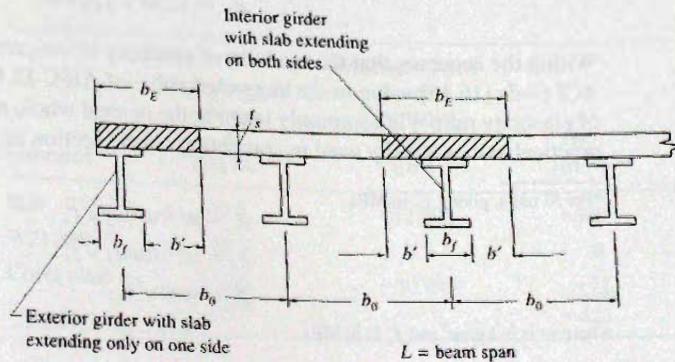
Dimensions governing effective width b_E on composite steel-concrete beams.
